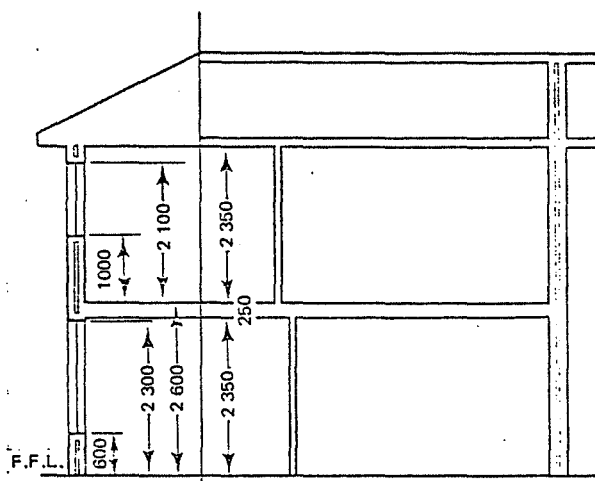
TRADITIONALLY CONSTRUCTED TERRACE HOUSE
